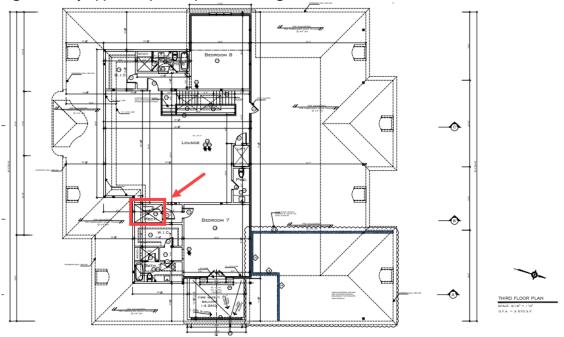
Closeup of 3rd floor City-approved permit plans showing 1 mechanical room
